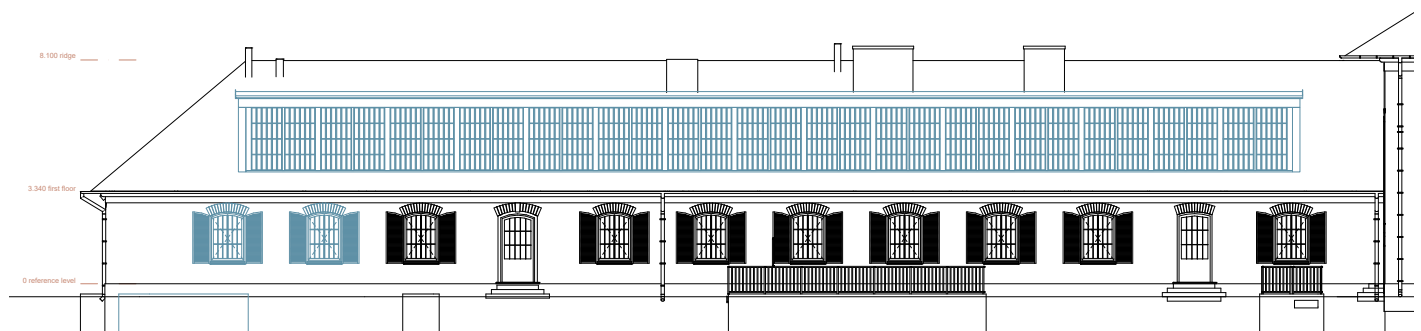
Elevation of the east façade of the south wing showing the new continuous dormer and carefully integrated window openings following the rhythm of the existing façade
